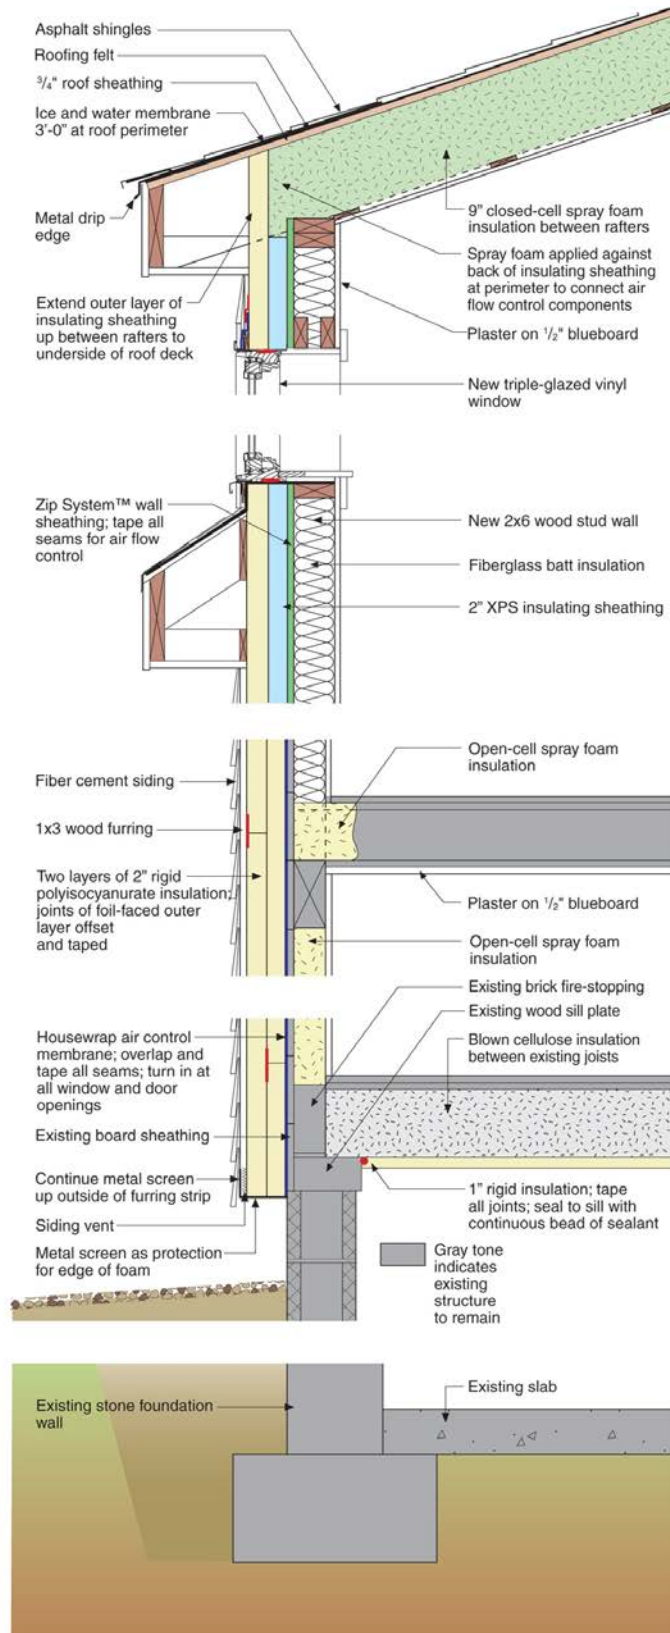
Schematic wall section for Test Home 3 enclosure retrofit strategy
